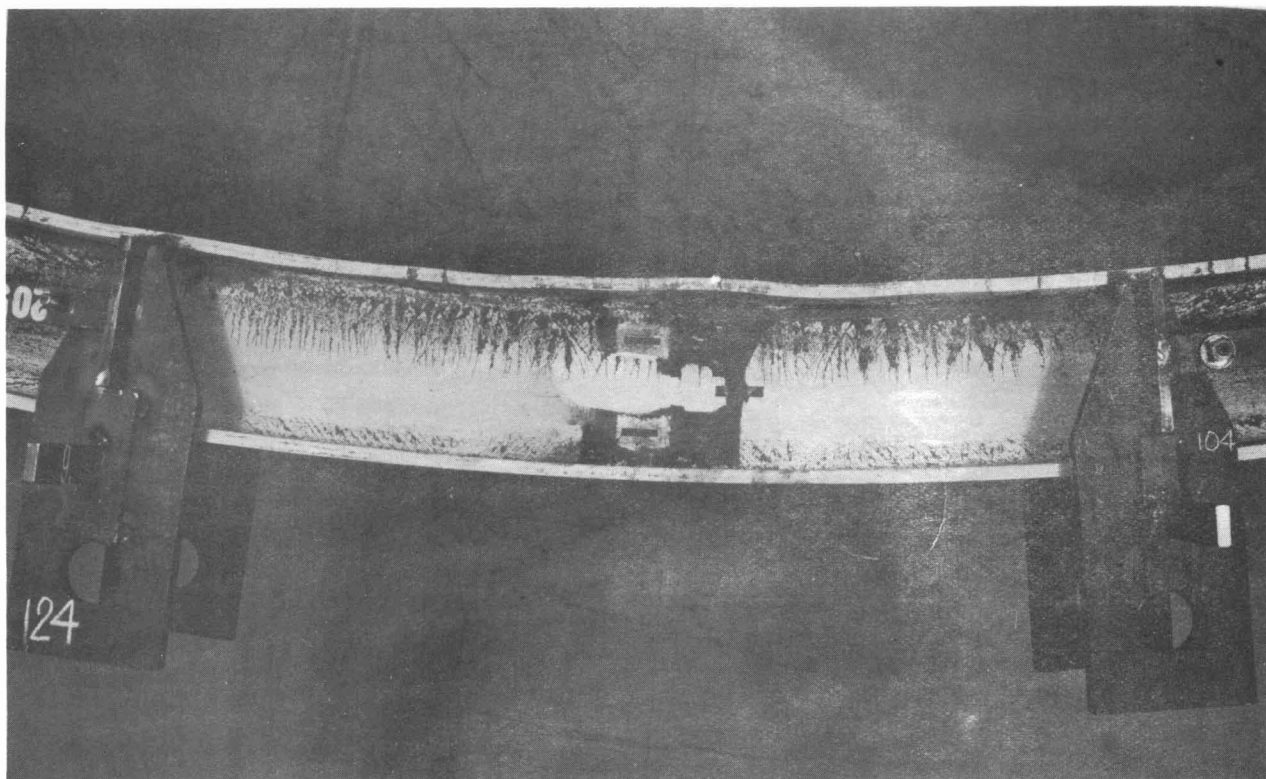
Central portion of Frame 1 under uniform moment. 8WF40 shape.
